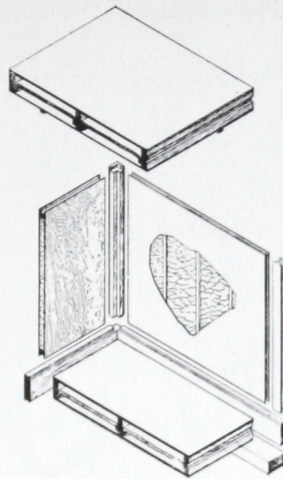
A standard assembly method for wall, floor and roof panels with a corner mullion and standard mullion. Cut-away views show insulation on place.
